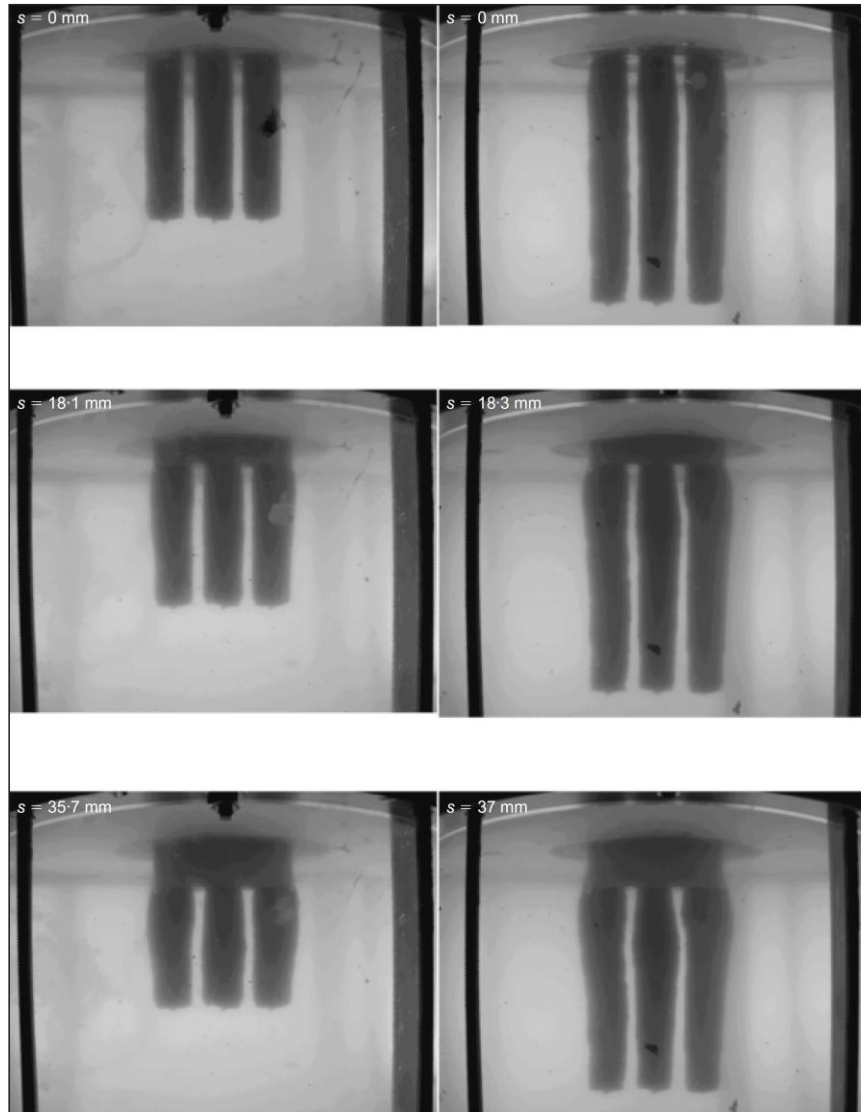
Model columns under a circular foundation (McKelvey et al., 2004)
